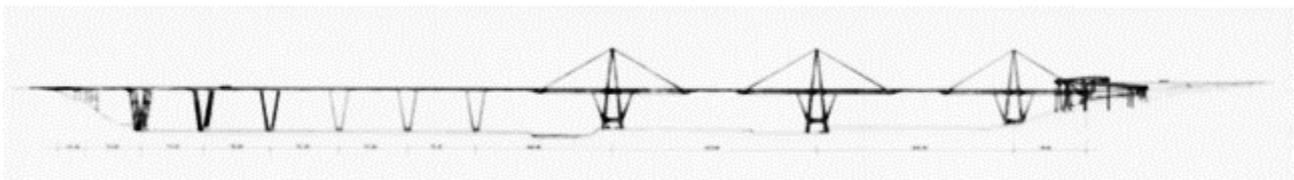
Elevation of Morandi proposal for Polcevera Bridge (ID-6) (Nutti et al, 2020).
